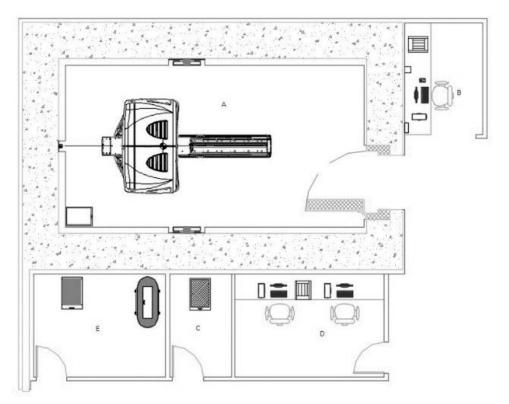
Typical Radixact System Floor Plan without Maze Walkway
